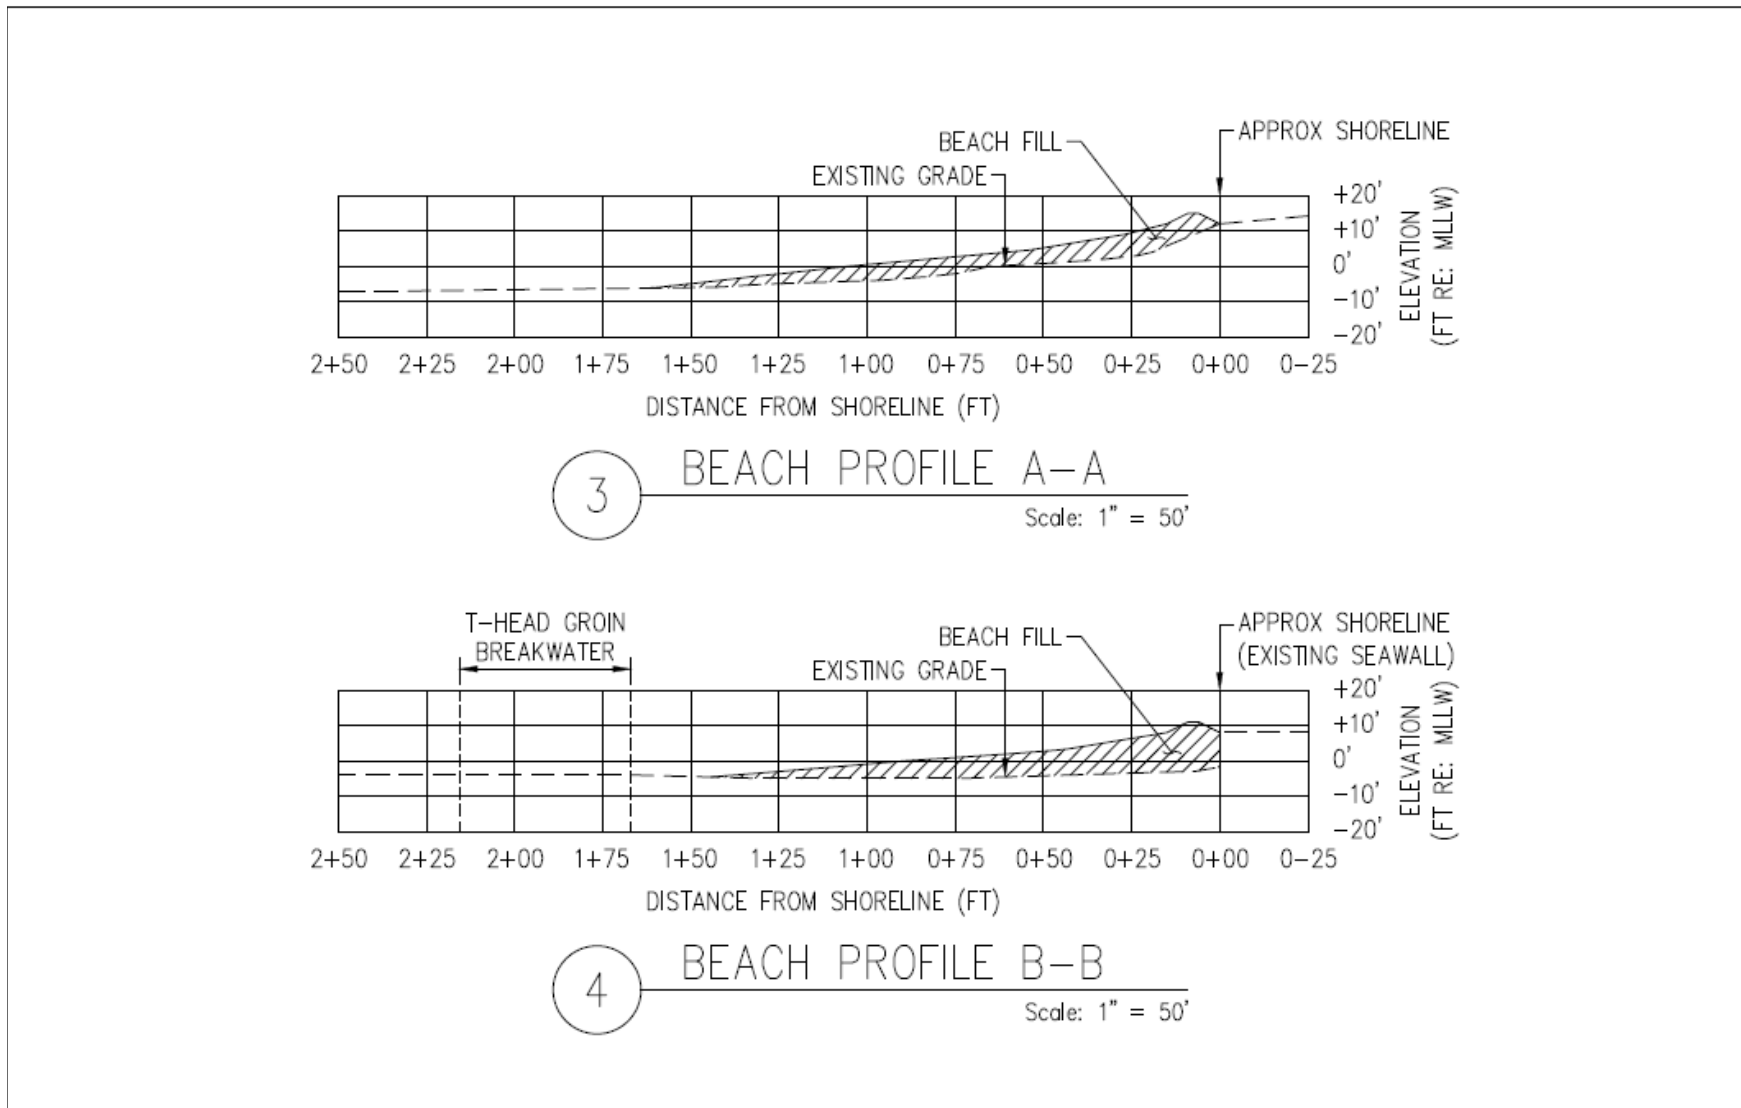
Special Profiles of Proposed Action: Beach Nourishment with Stabilizing Structures
